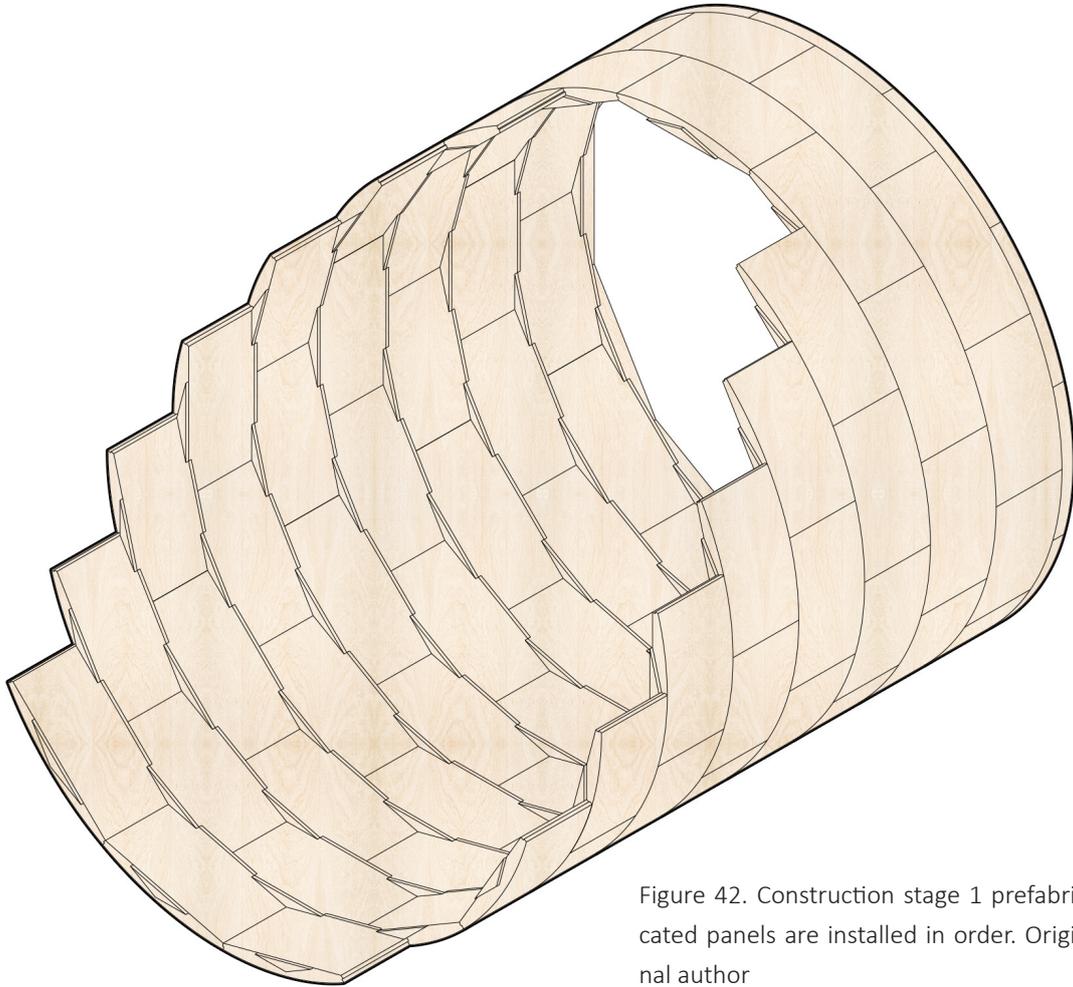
Construction stage 1 prefabricated panels are installed in order. Original author
